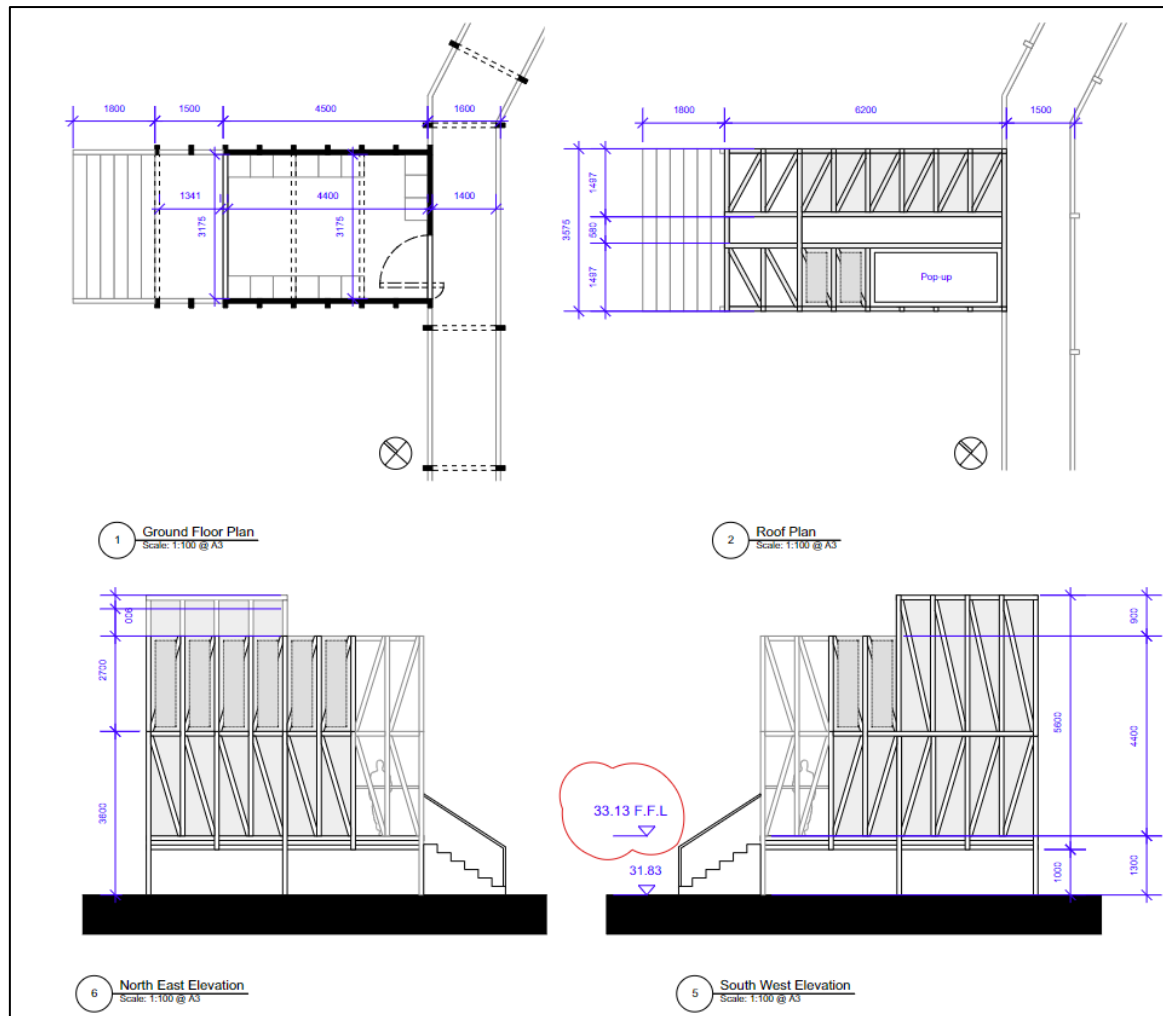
Layout drawings of the proposed Weather Shelter Pod to be located near the new mooring point at the northwest shores of Inis Cealtra.
